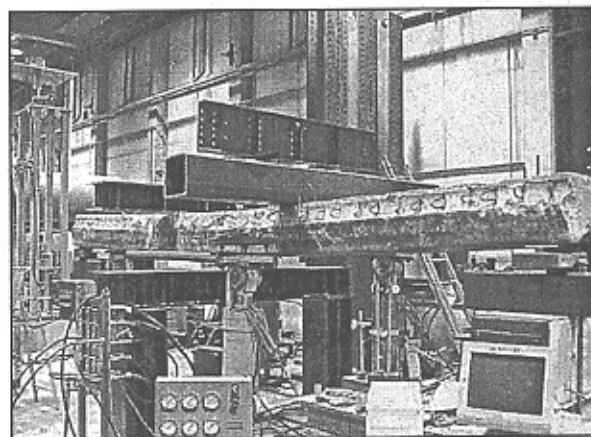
Retrofitted full-scale bridge girder tested to failure.
